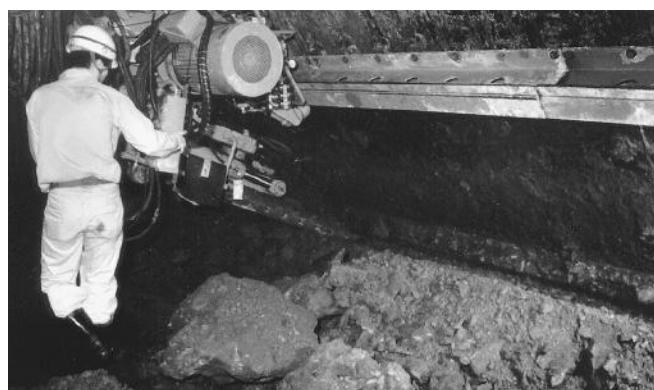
Excavating beneath the cutting edge of a pneumatic caisson. (Courtesy of Shiraishi Corporation, Japan.)
